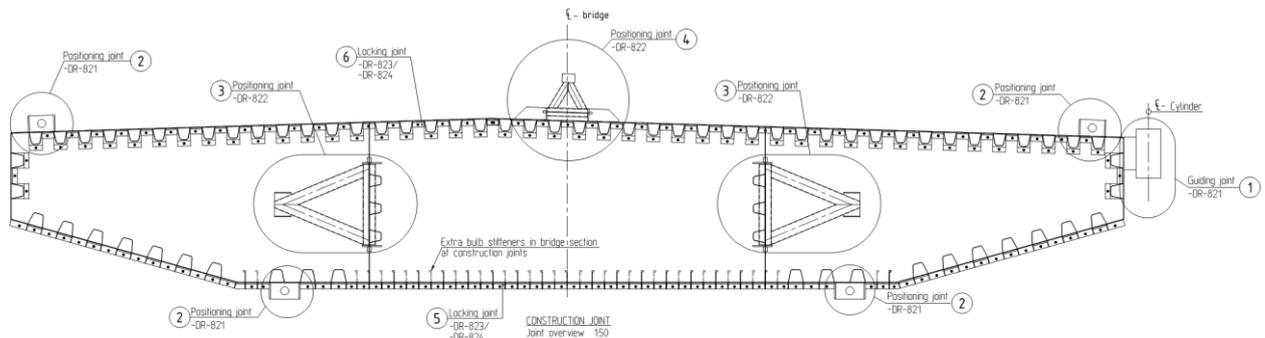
Cross section in bridge deck of floating bridge, 4.0 m deep and 27.0 m wide
